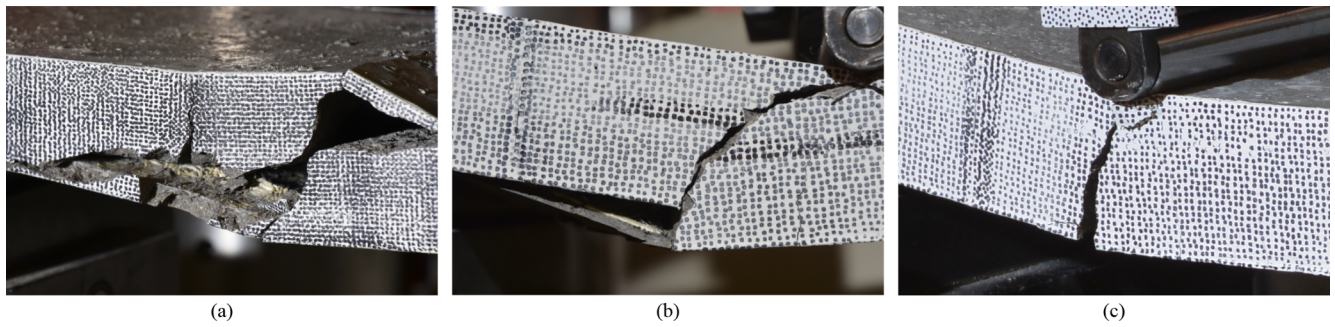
Failure mechanisms: (a) bond ribs breaking out of concrete; (b) delamination of bottom-edge reinforcement; (c) bending-like failure in cement paste-coated specimens.
